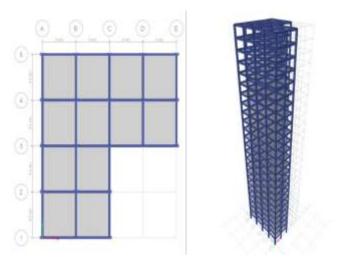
PLAN VIEWOF L SHAPED BUILDING 3D VIEW OF L SHAPE
